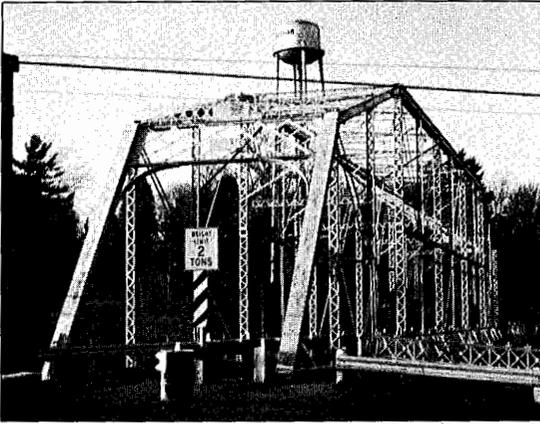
The Stuyvesant Falls Bridge viewed from the south.
